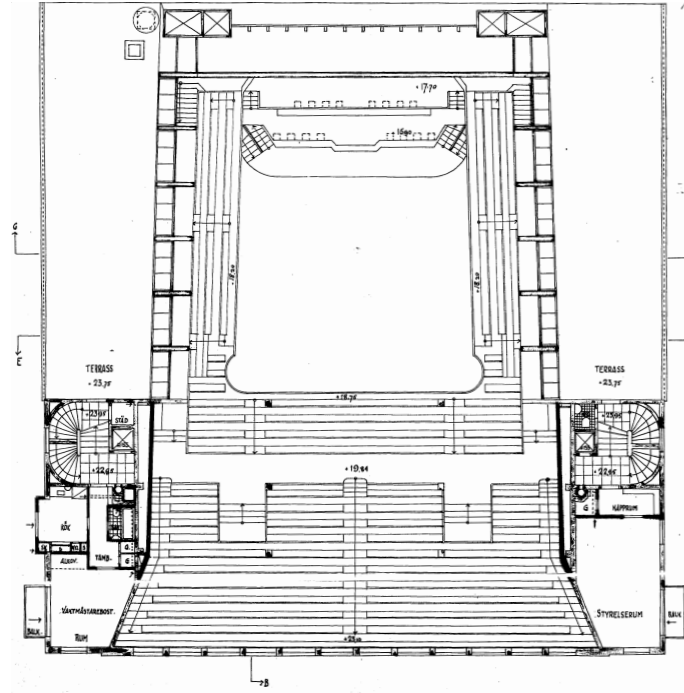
Original drawing (1940) (Göteborgs Stad., n.d.)
